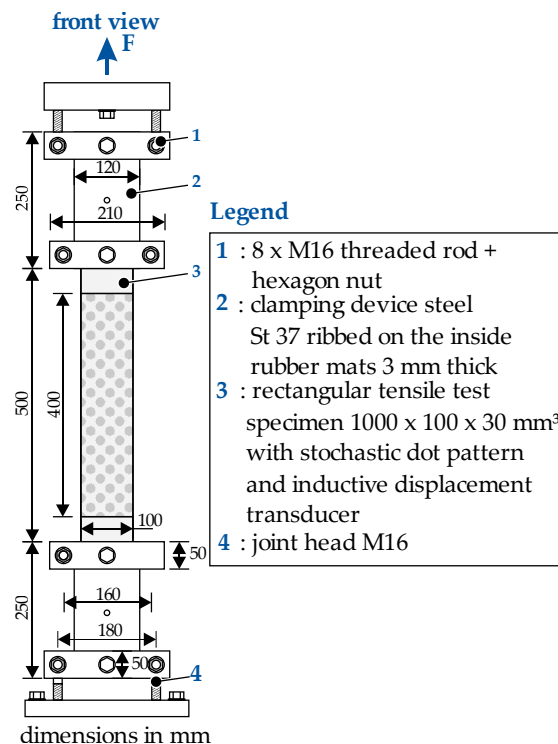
Test setup for the tensile strength tests on rectangular CTRC specimen – Schematic drawing.
